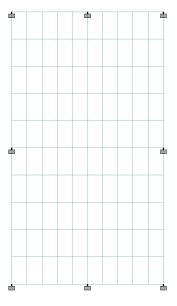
Plan of water tank L/B 1.6 Fig:5Plan of water tank L/B 1.8
